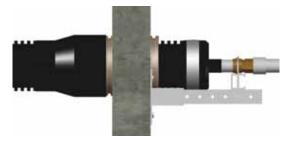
Wall Sleeve with Heat Shrink Seal Kit
